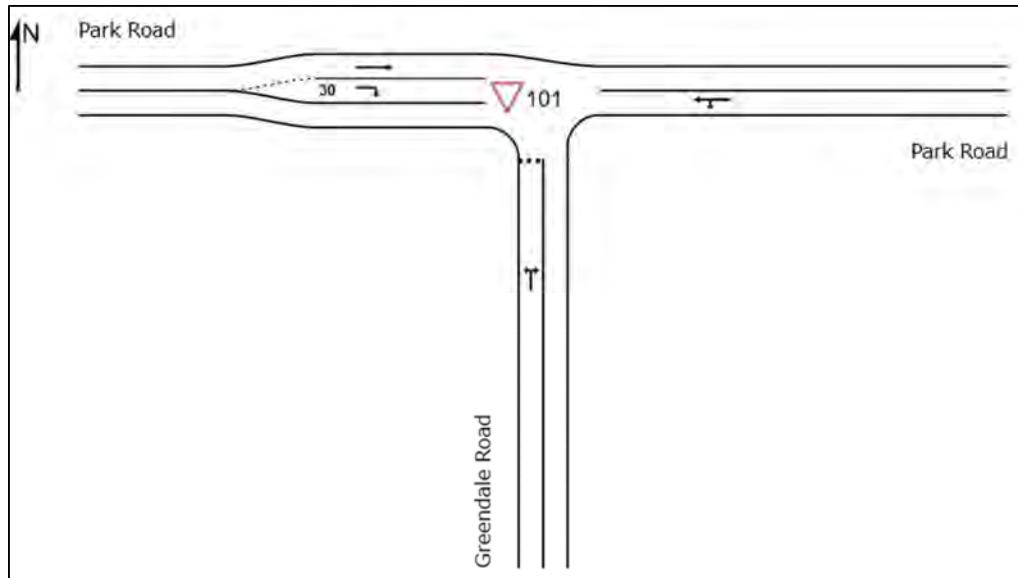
Priority Intersection of Park Road with Greendale Road (SIDRA)
